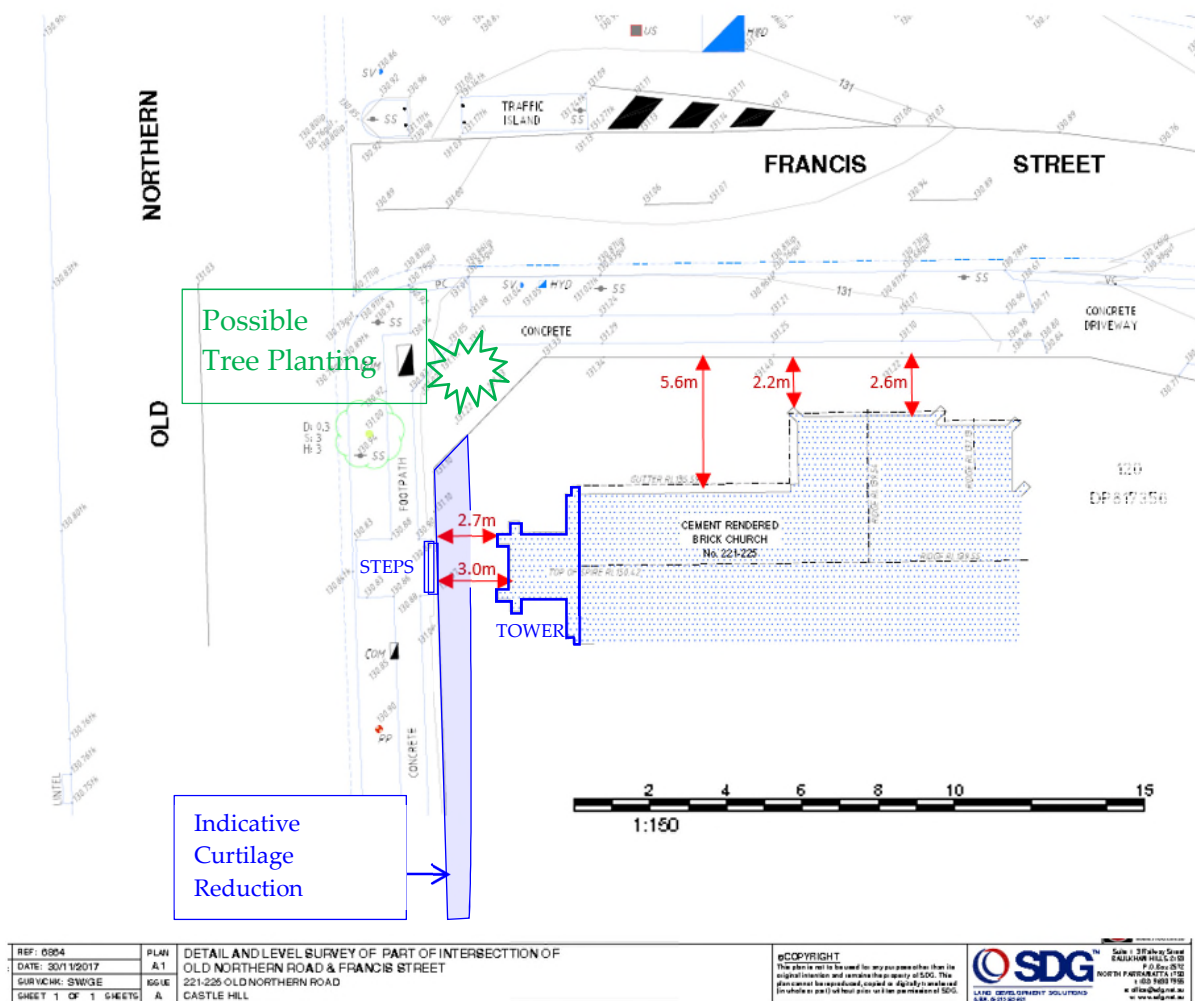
Detail Survey of State Heritage Item – Former St Paul's Anglican Church showing proximity of the Church's Tower to Old Northern Road and indicative road widening for Options "X" & "Y"
